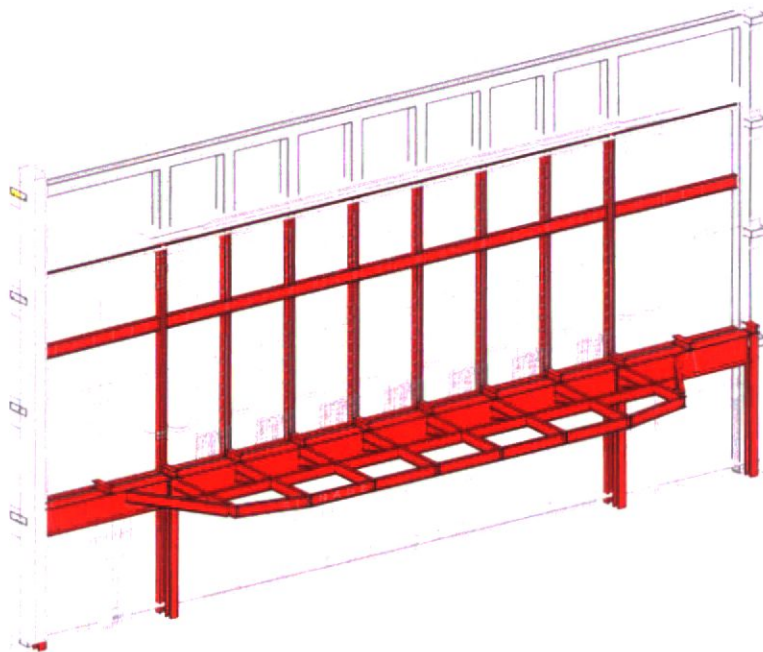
52-54 (Carlton Façade) O'Connell Street Upper Steel Frame Support
